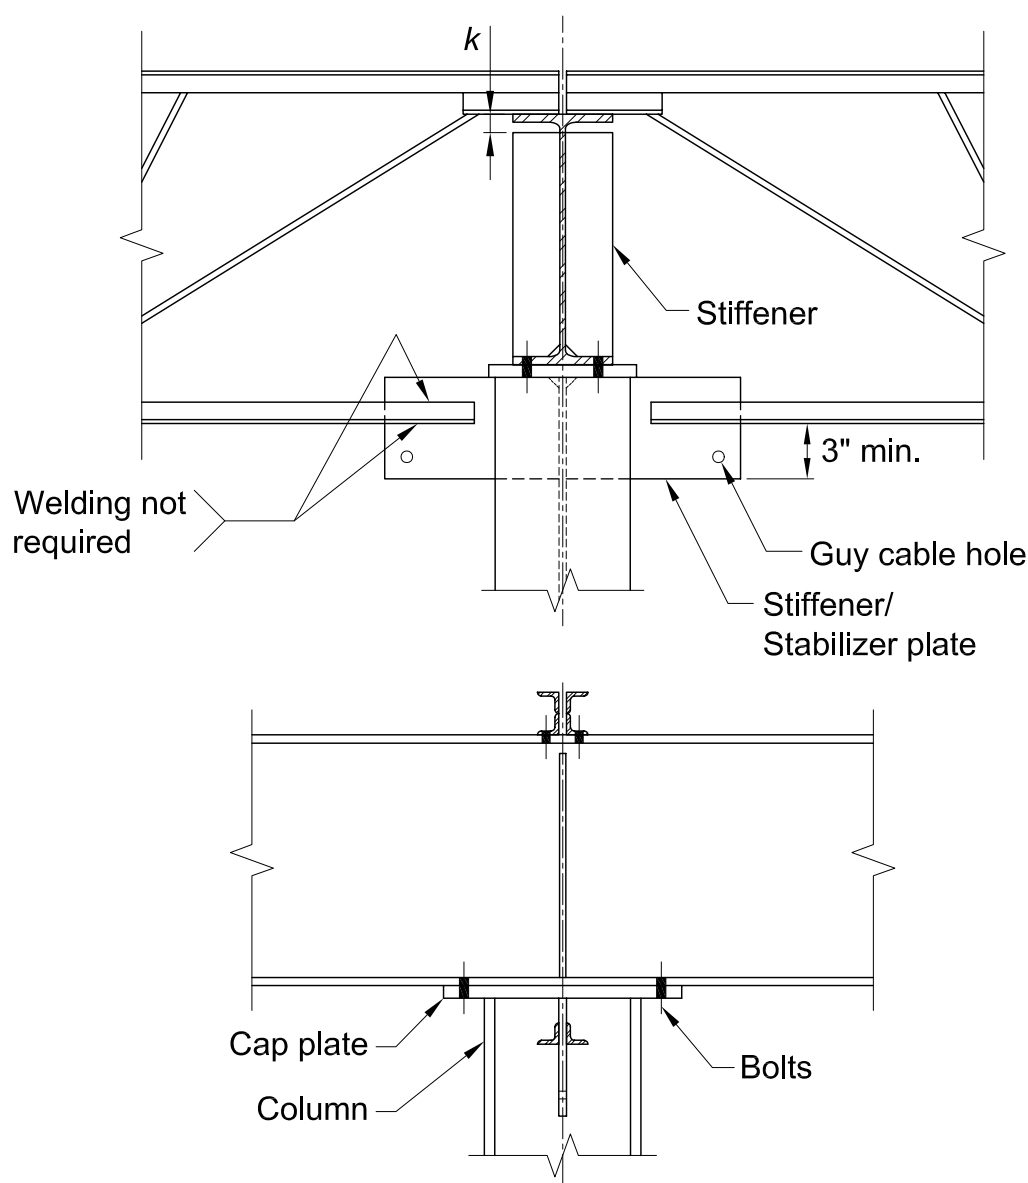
Beam framing continuously over column top, stability provided with transverse stiffeners, joist chord extensions located at column top not welded.
